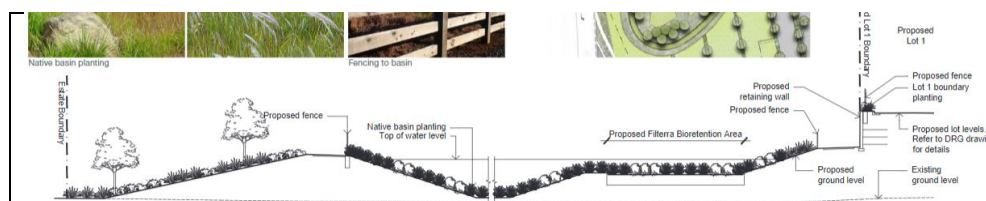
Excerpt from amended Landscape Masterplan indicating no canopy trees planted along western boundary of Warehouse 1.
